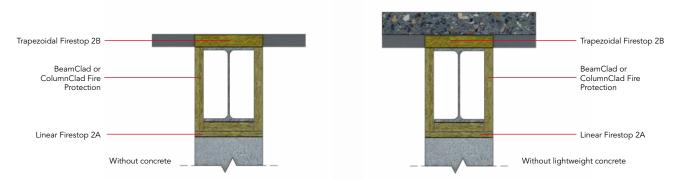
Profiled metal deck with/without concrete over a universal beam
